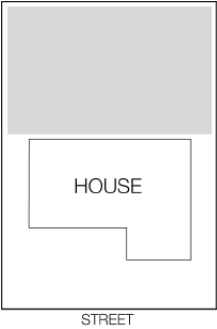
Exemptions for additions, external alterations and outbuildings for buildings not on a corner site. The rear yard must not abut a street.
